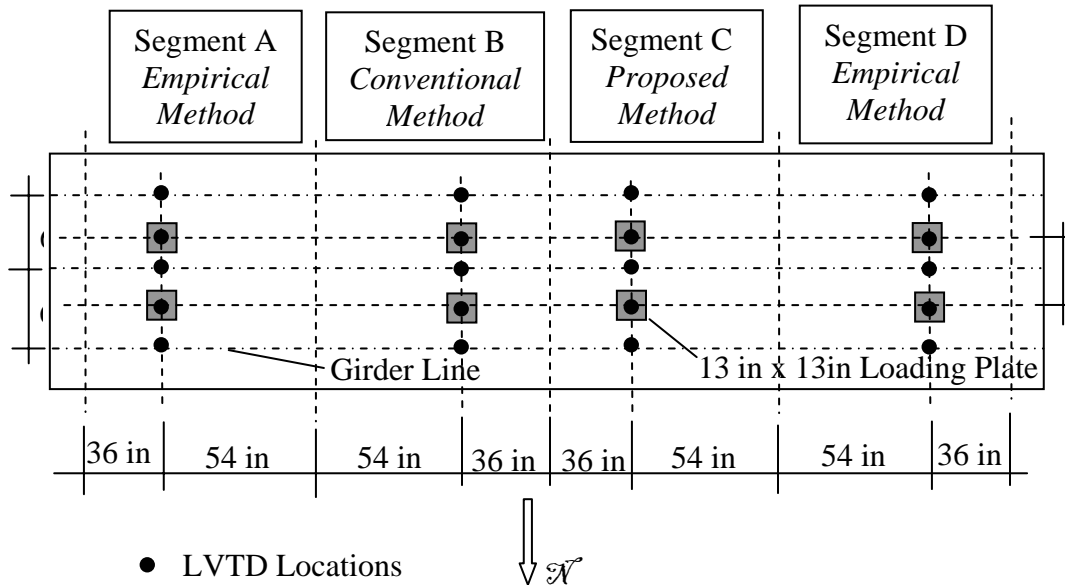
Loading and LVDT Positions for Static Load Tests
